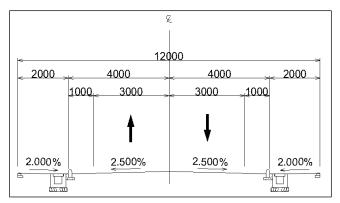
Standard Cross Section (Width = 12 m)
